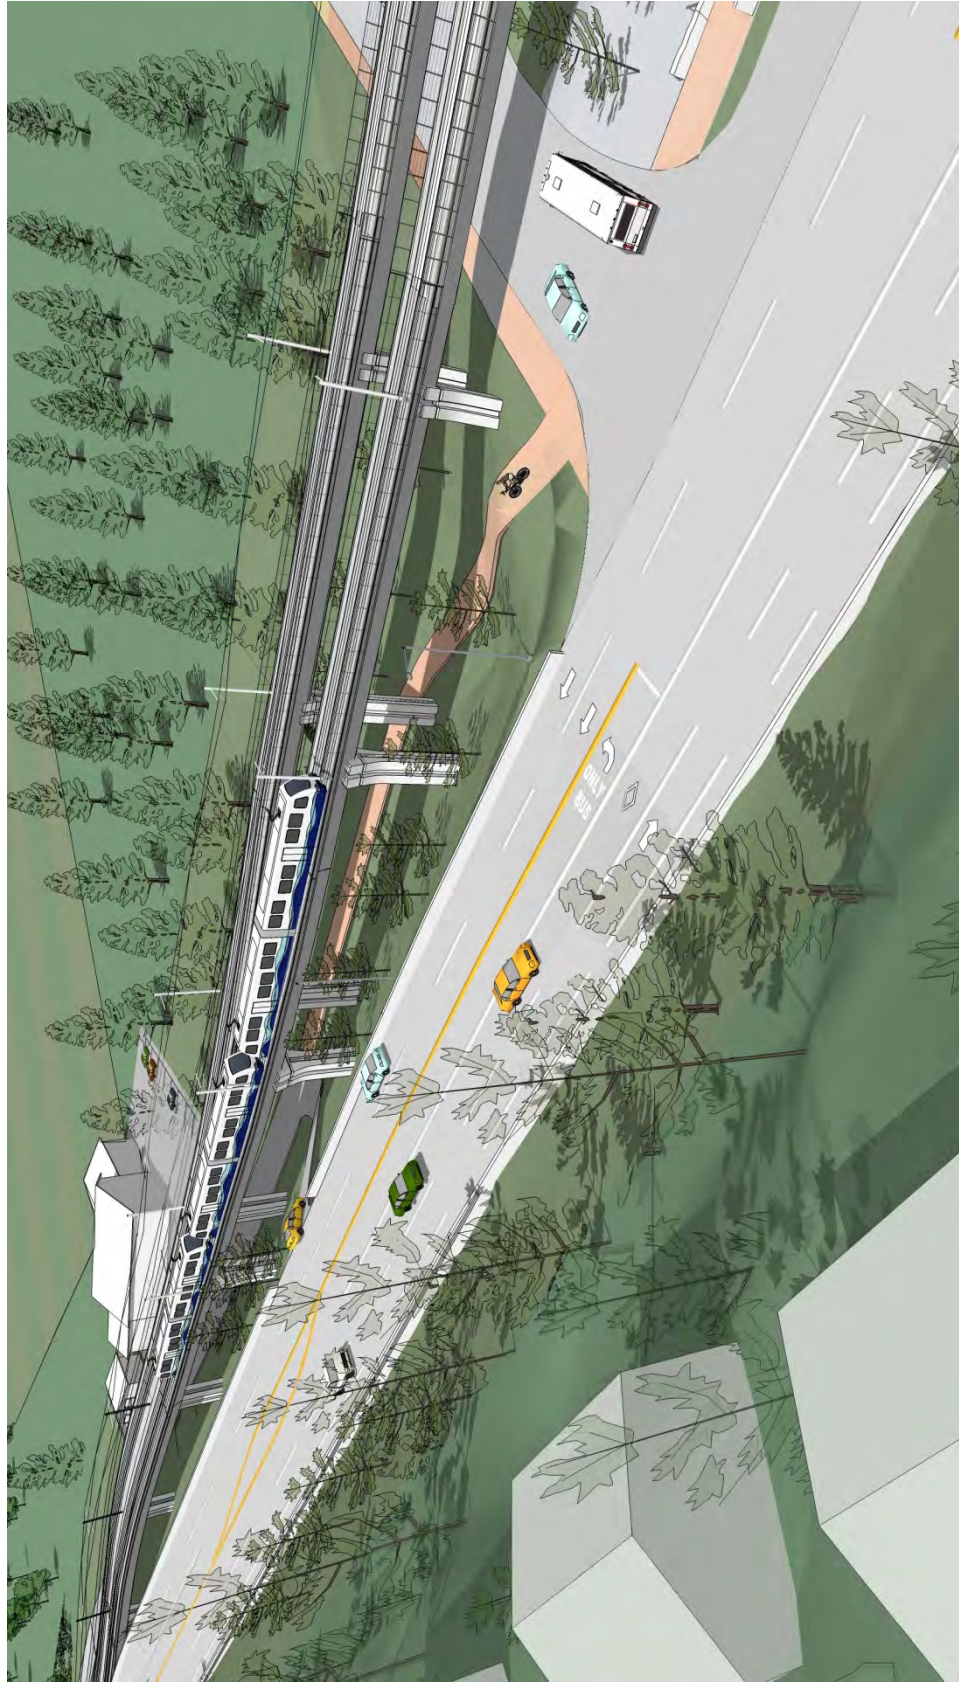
8: Bellevue Way Alignment at Winters House - Shift Bellevue Way West with City of Bellevue HOV Lane— Looking North at Blueberry Farm Access – Cost Savings Idea 1a
